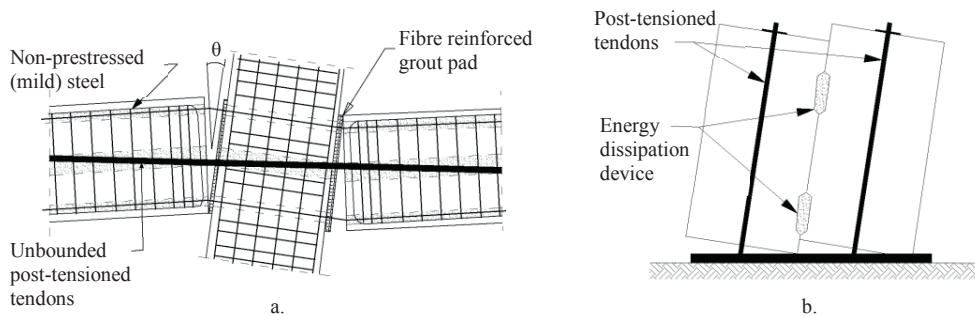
PRESSS Concept : Full Self-centering with post-tension unbonded connection [7], 1(a) Frame,1(b) Wall
